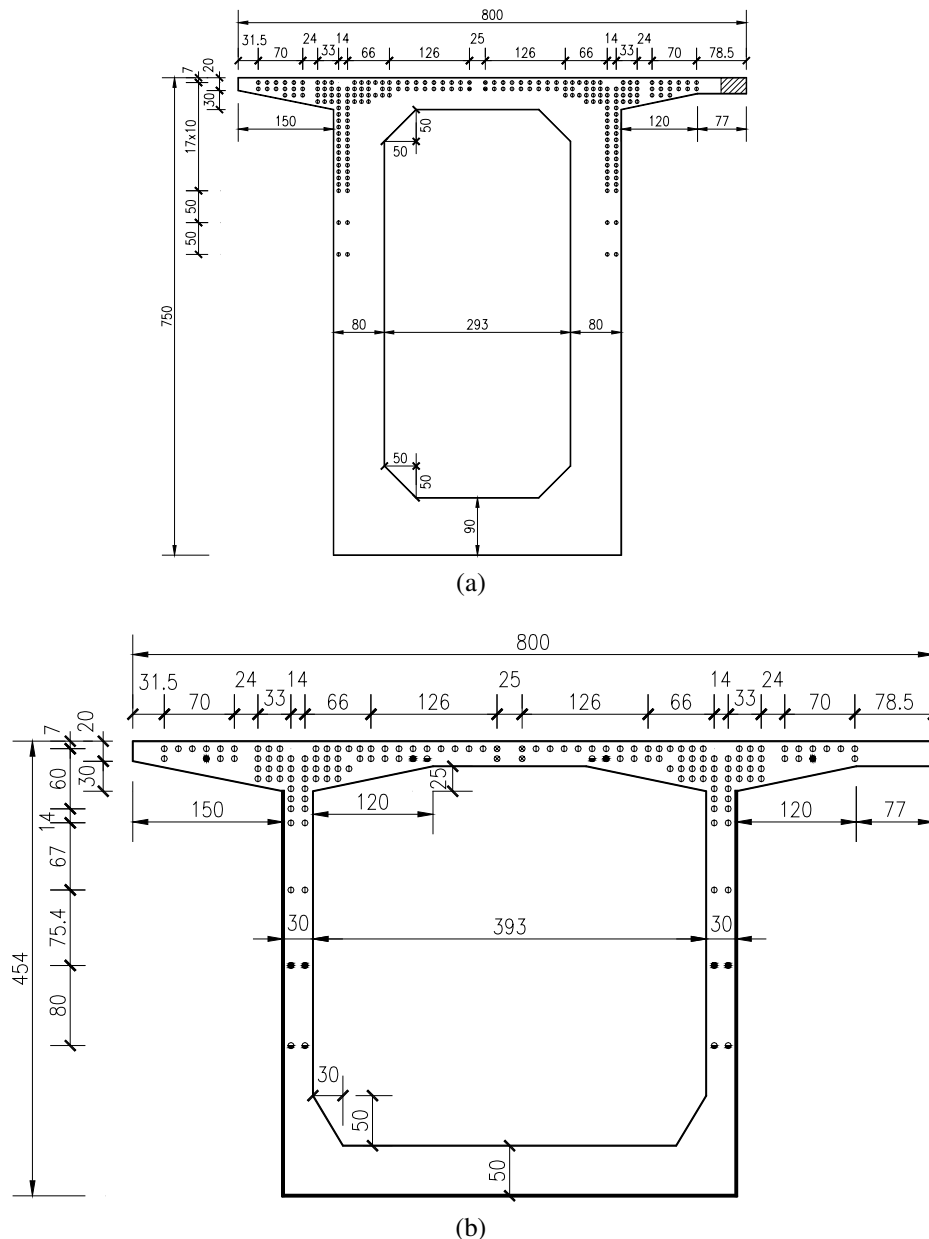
The box girder layout, (a) pier box girder, (b) span box girder.
